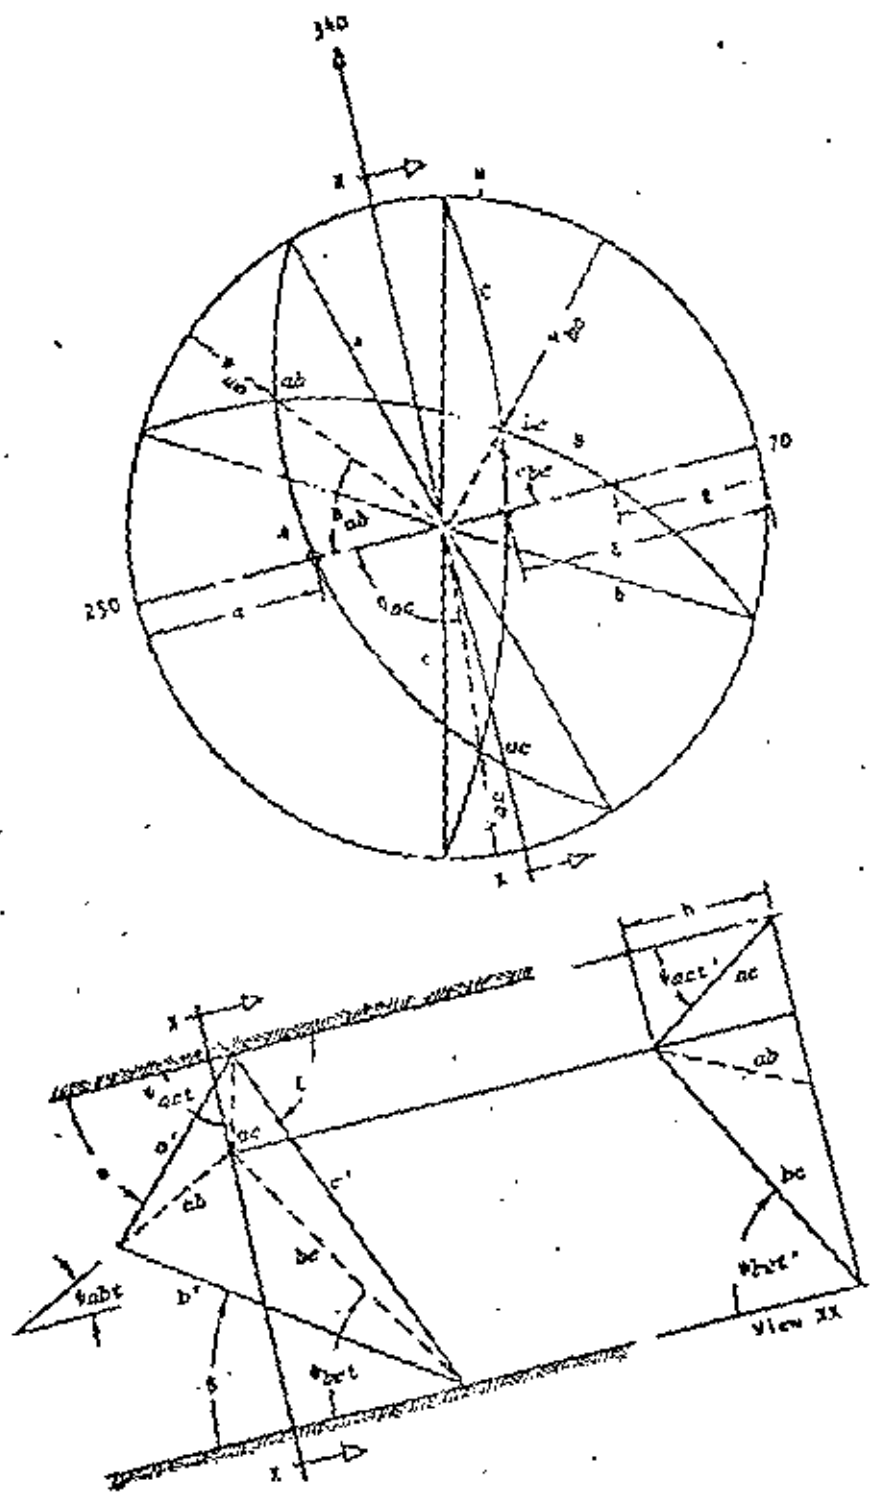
Construction of the true view of a wedge in the sidewall of a tunnel by Method 2.
